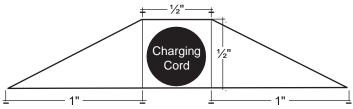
CROSS-SECTION OF RAMP REQUIREMENTS FOR UP TO ½ INCH
